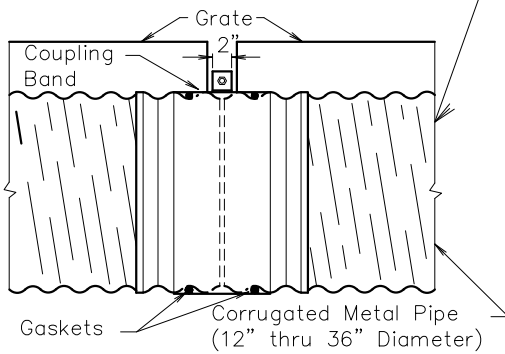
CULVERT-CMP SLOTTED DRAIN-1
